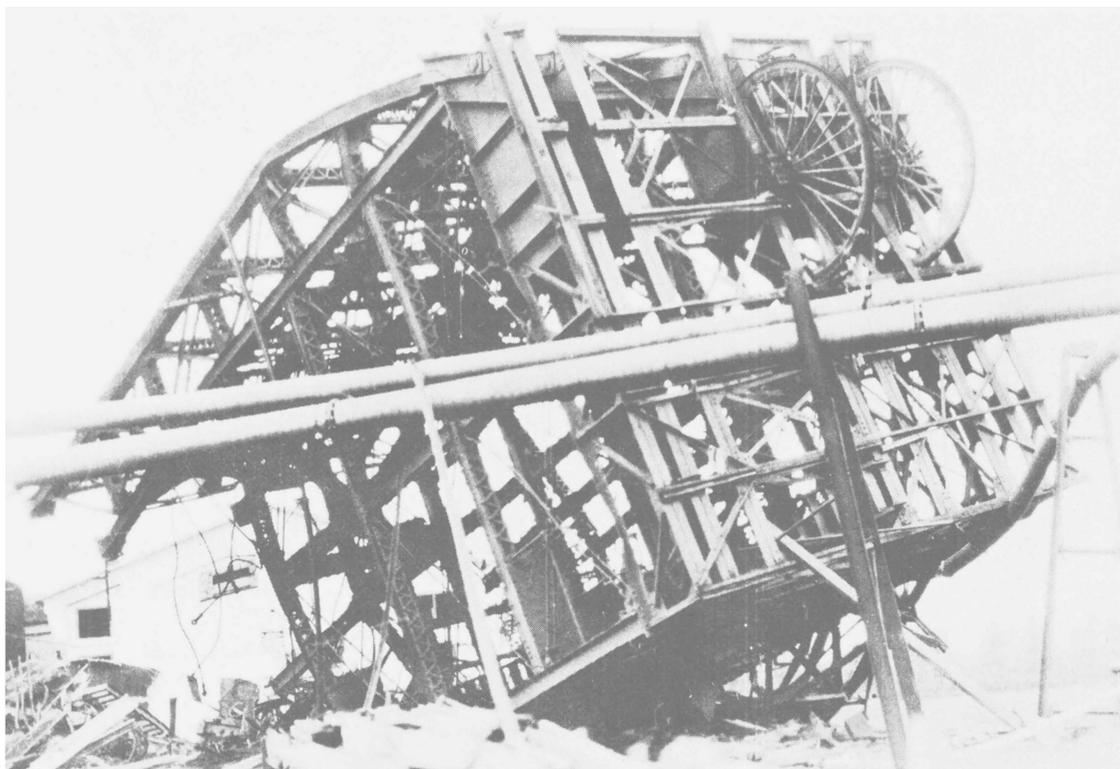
Headframe of Woodward No. 3 shaft, Edwardsville, Pa., after explosion, May 26, 1927.
